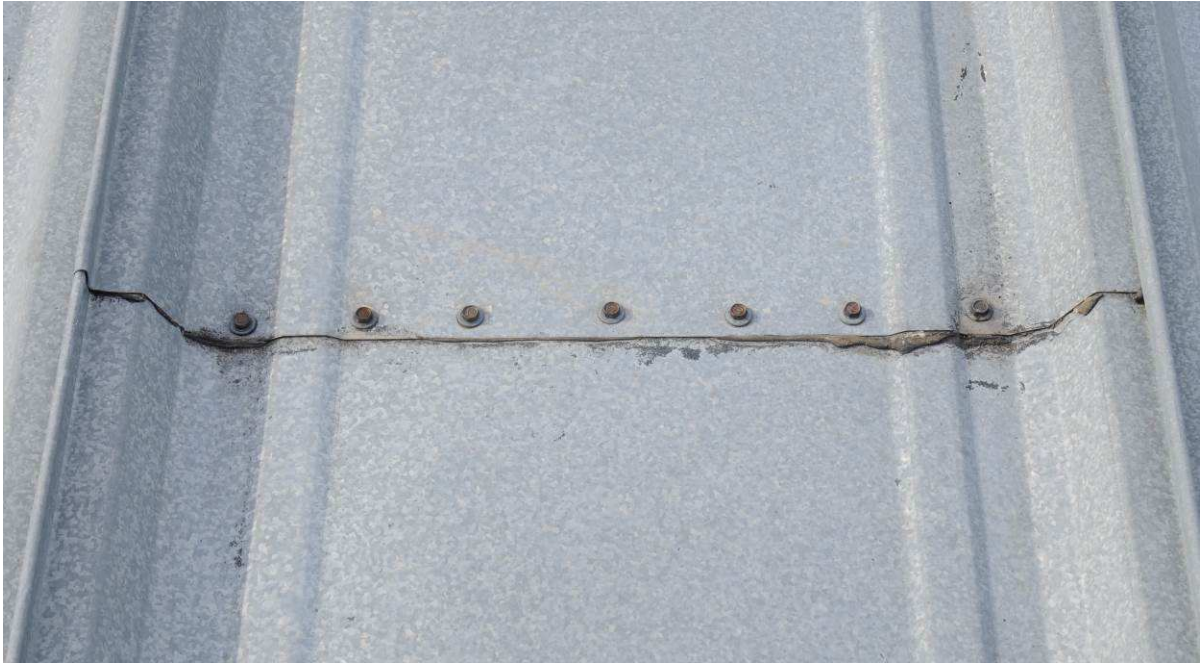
Typical asphalt mastic application at the interface between the sheet metal flashings along the eve of the roof system and metal roof panel on the north and south elevations. Photo taken at south elevation. All asphalt material to be removed prior to installation of new microsealant tape material.
